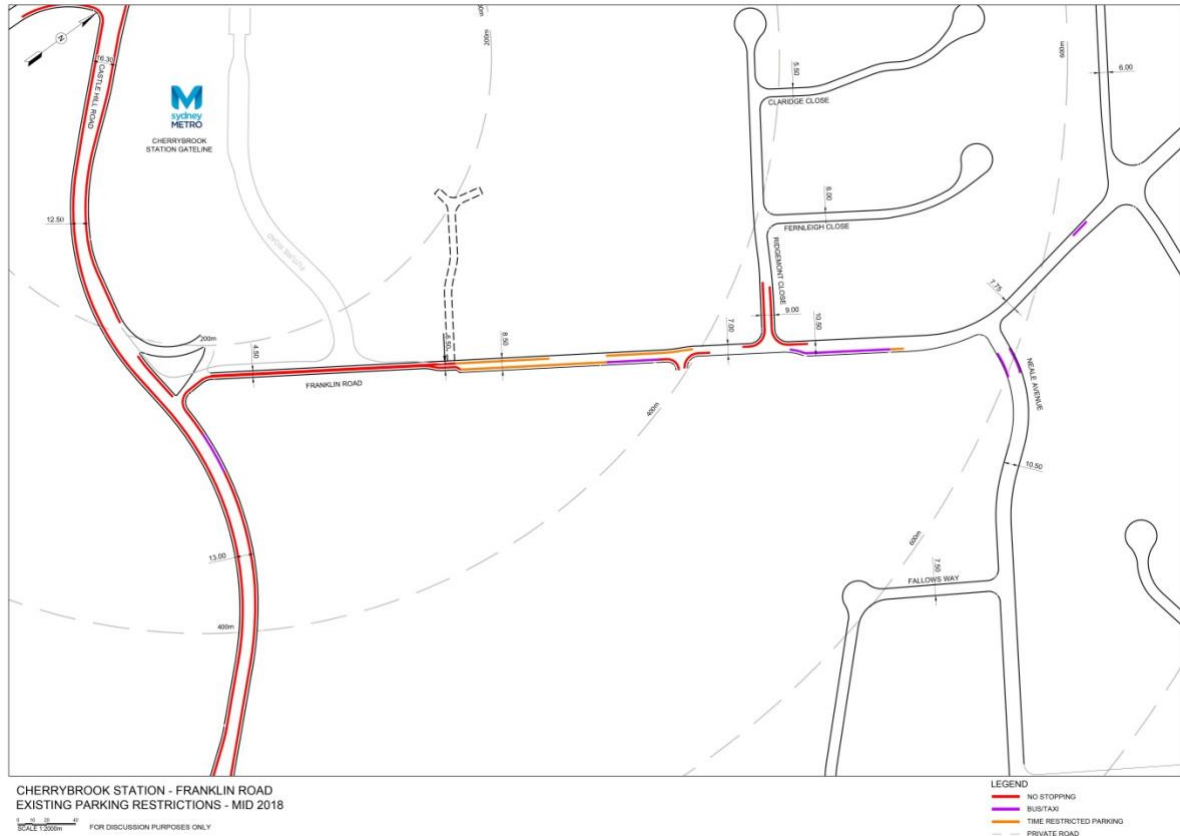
Pre-metro parking conditions mid-2018 – Franklin Road and linking streets
